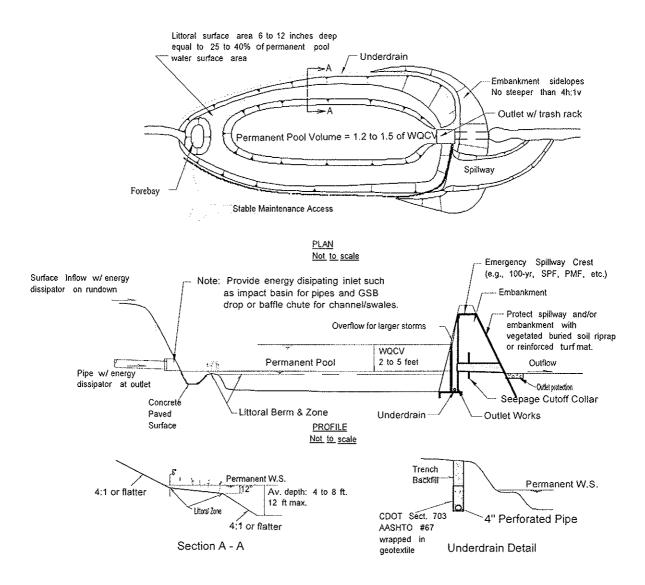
Retention Pond (RP) - Plan and Sections
